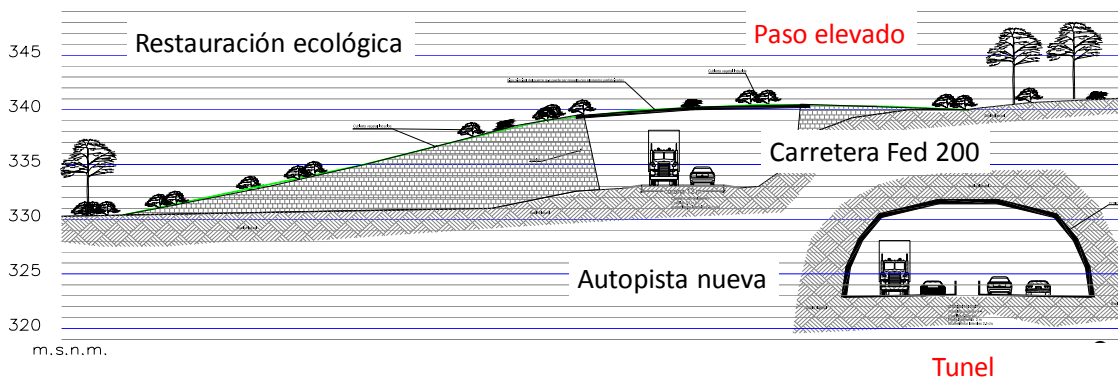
Animal upper pass construction for the 200 existing federal road for ecological compensation to recover the jaguar movement corridor interrupted by the old road construction. The new road Project looks for a tunnel so the mixed action of both structures allows the corridor recovery.
